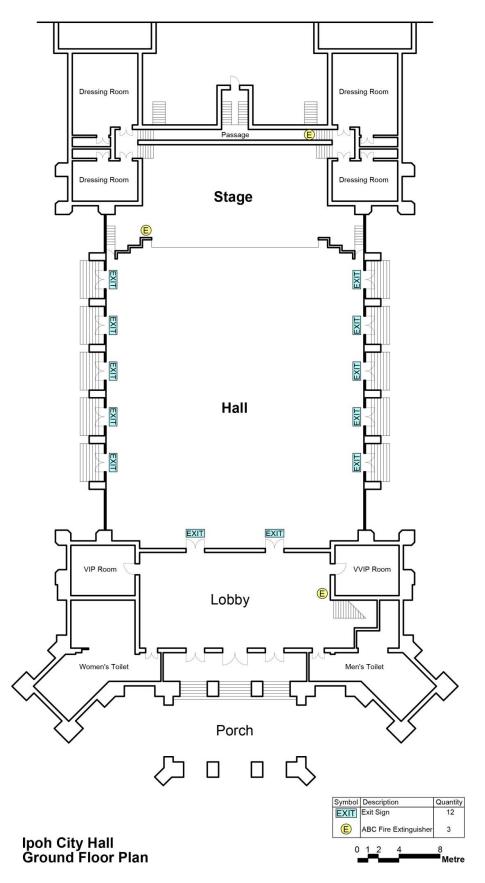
Location of active fire protection measures at Ground Floor Level of Ipoh City Hall
